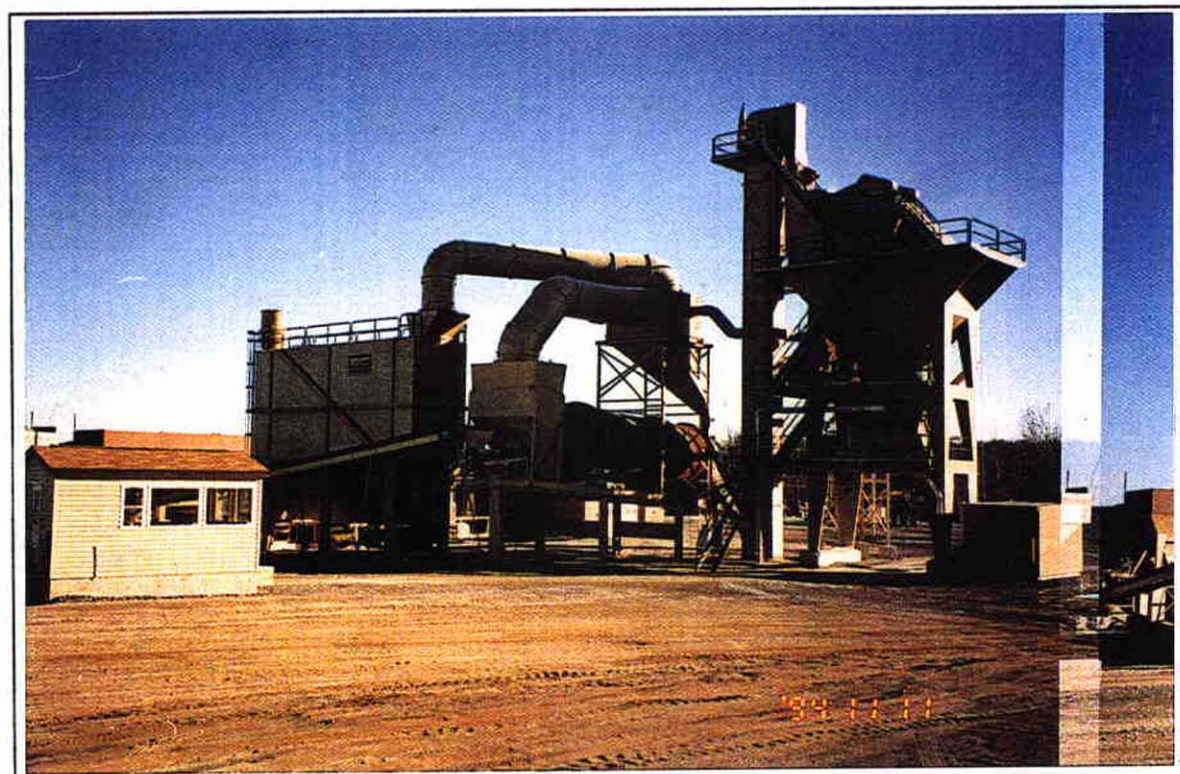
Genesee LeRoy Stone Corp. Asphalt Batch Plant in Stafford, New York
